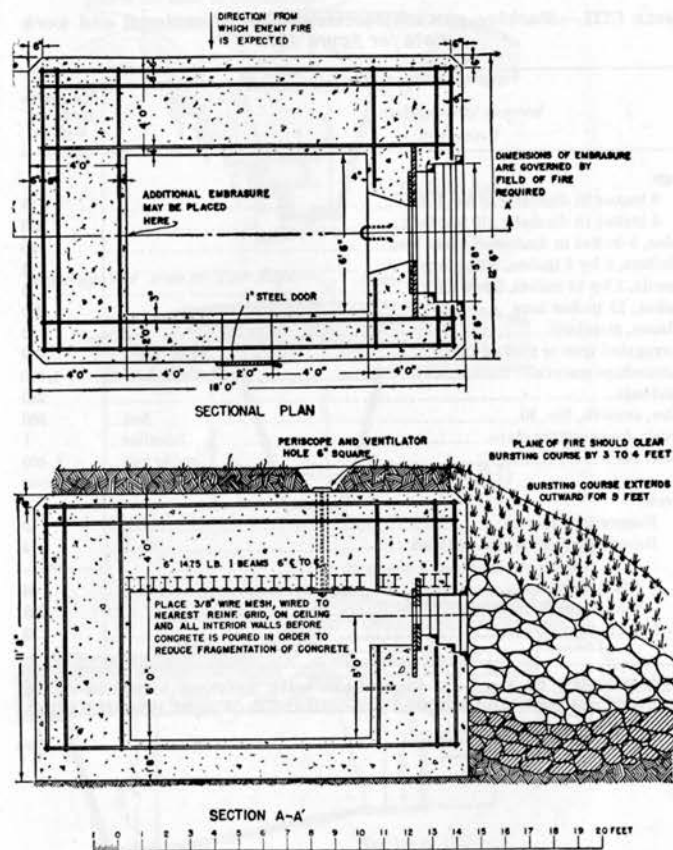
Light shellproof machine-gun emplacement (sectional plan and elevation).
